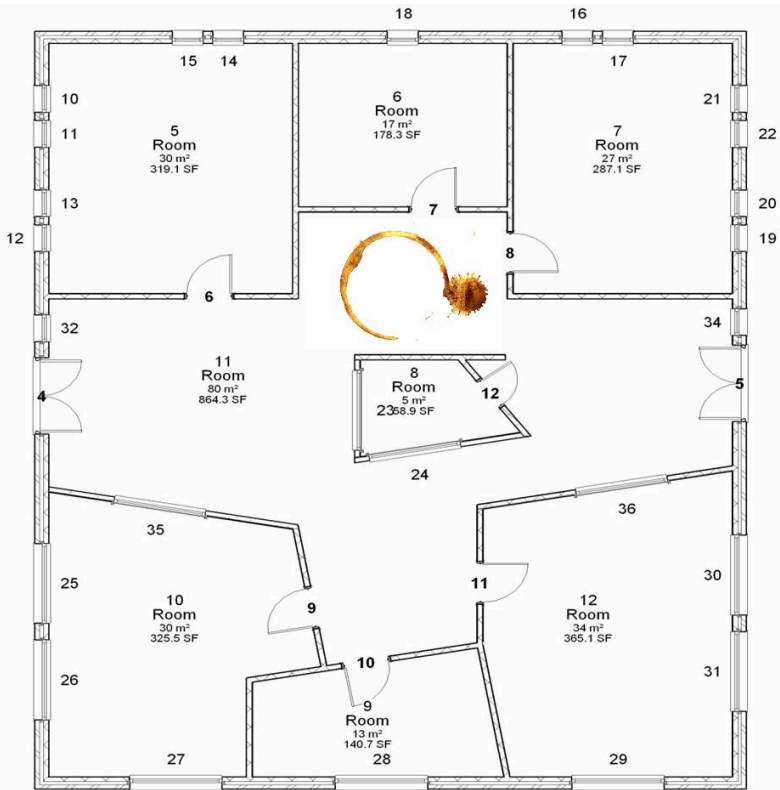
A new state of the floor plan: the coffee stain is neither well-formed nor meaningful in the framework of a line drawing
